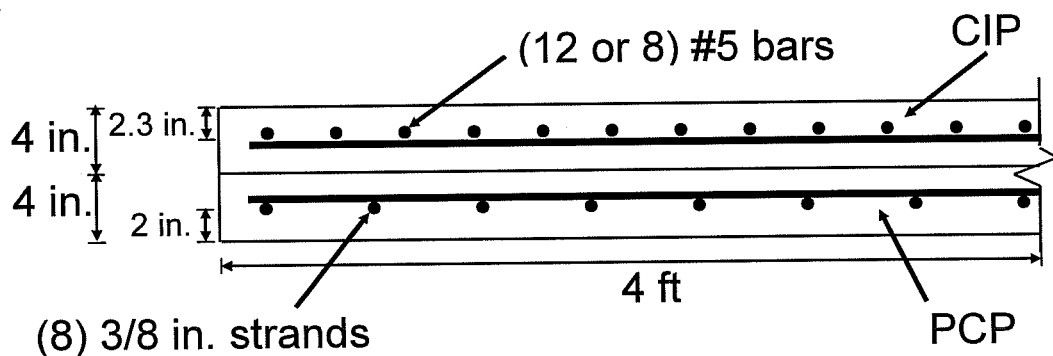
Cross-section of Prestressed Concrete (PC) Panel and Cast-in-Place Concrete Topping Section
